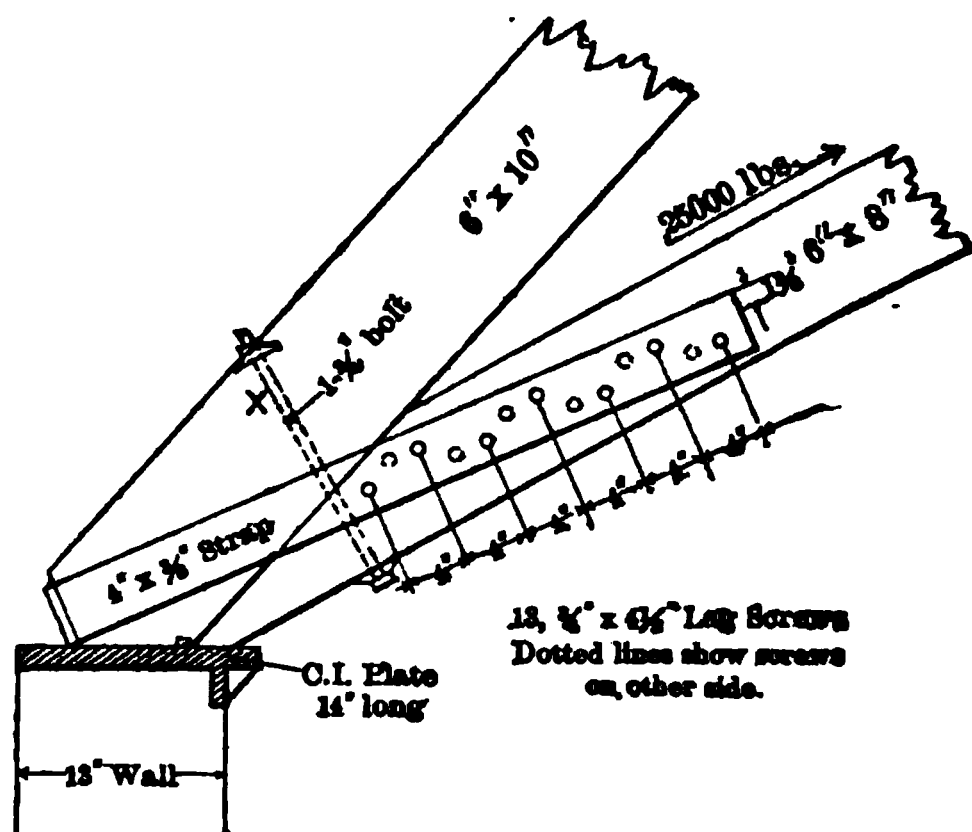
Wall-joints for Scissors Trusses, Figs. 24 to 27, Chapter XXVI
